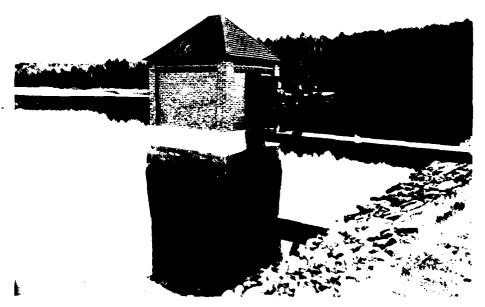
Gatehouse as seen from the crest of the dam.
